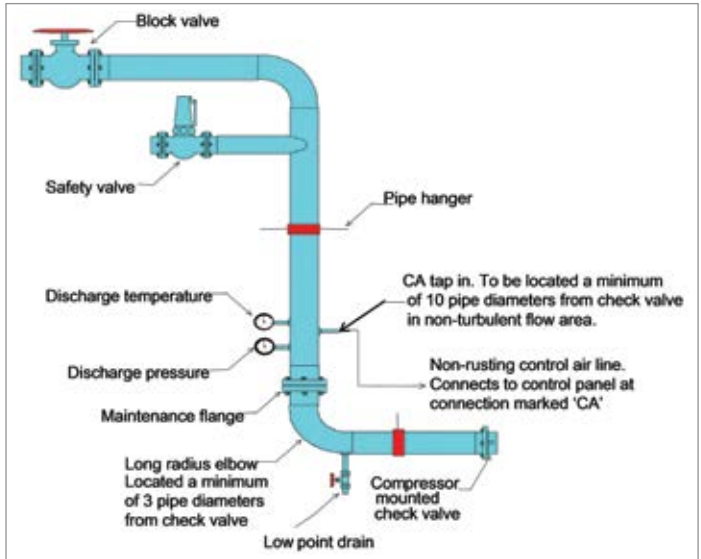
Be sure to install a properly sized safety valve before the block valve for centrifugal compressor discharge piping.
